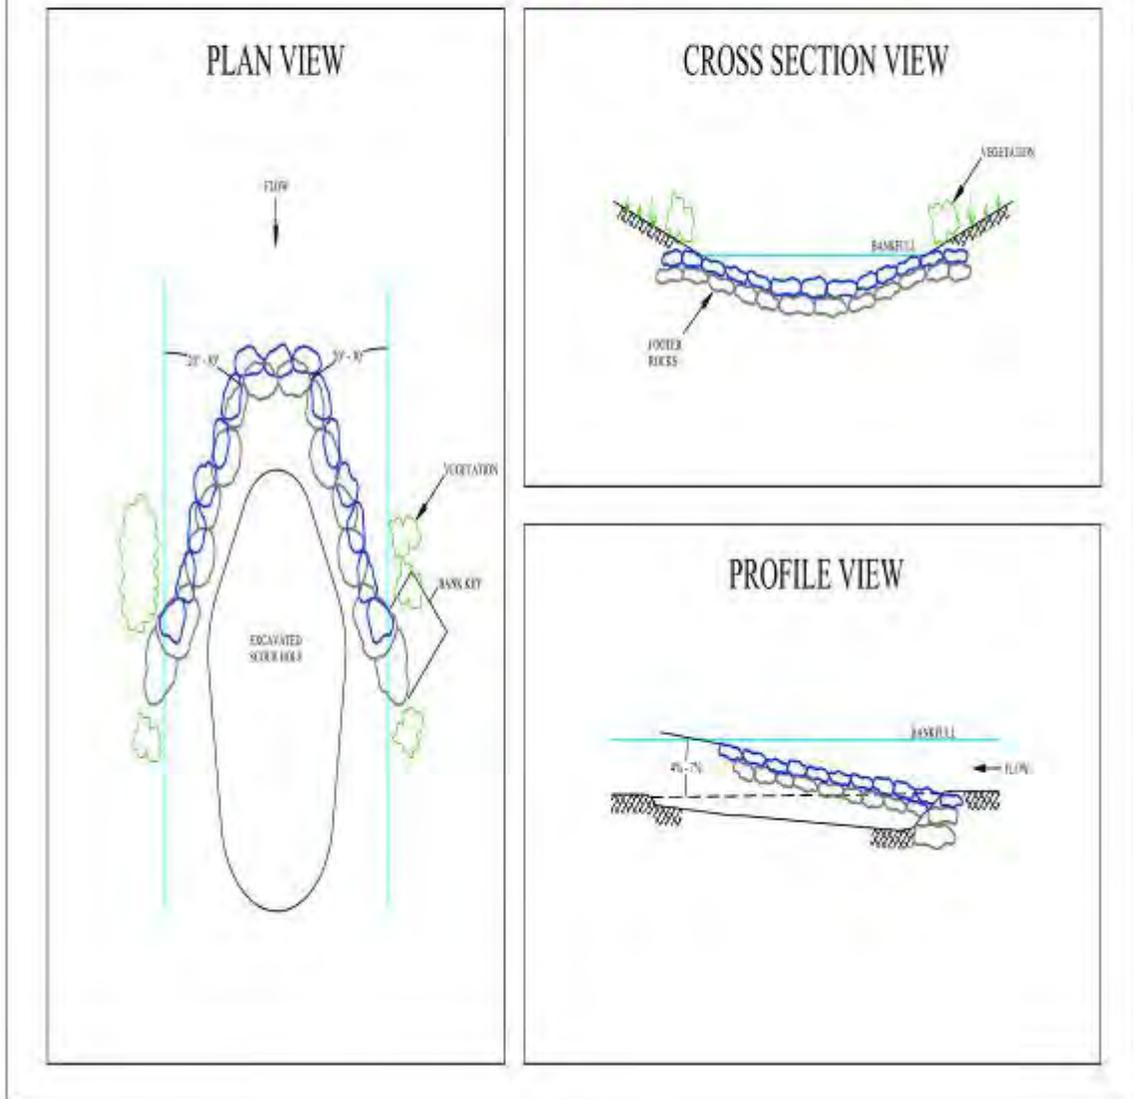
Typical Rock Cross Vane Structure Construction Drawing
